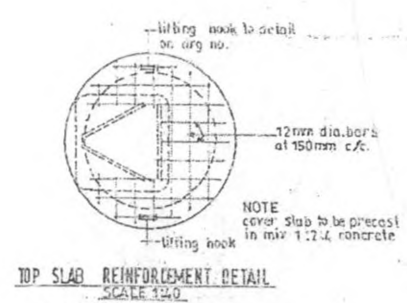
Standard Manhole and Trench and Pipe Details
